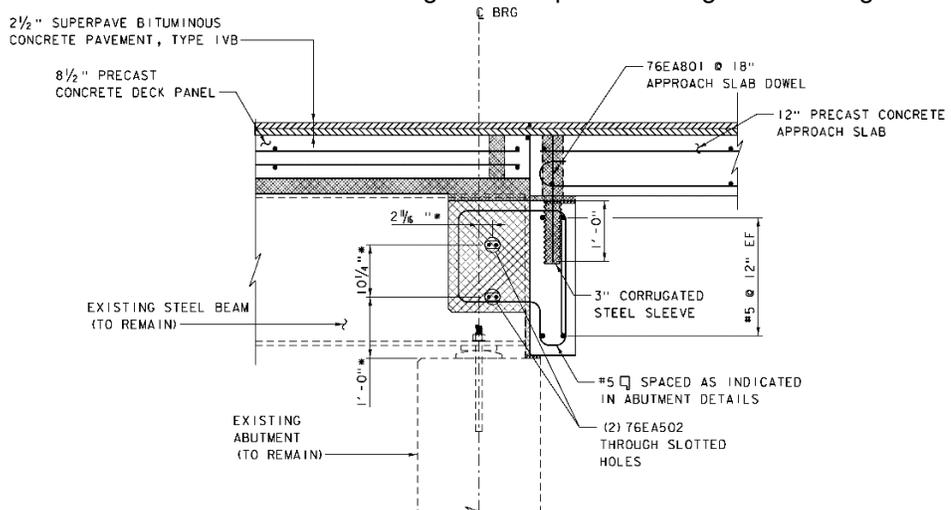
Fixed End Precast Conc. Curtainwall & Approach Slab
